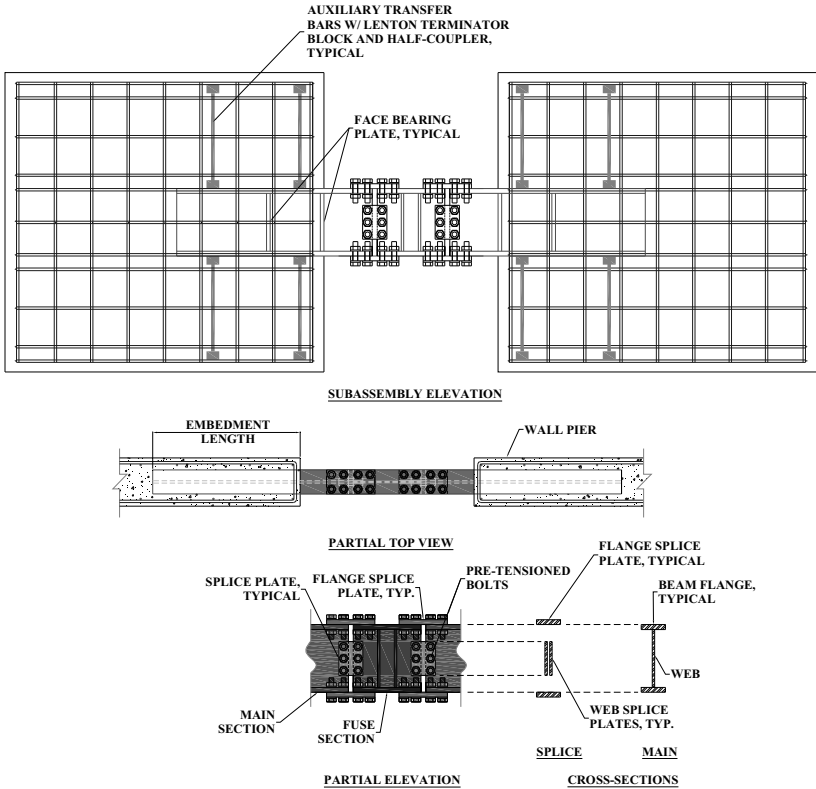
Schematic drawing of steel coupling beam with a central fuse
